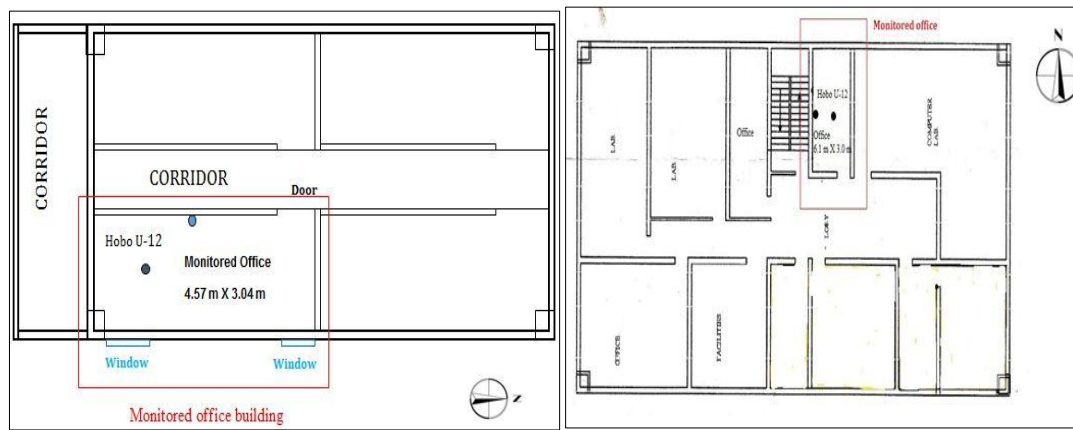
Plan layout of monitored high thermal mass office buildings (a) stone wall construction (b) brick wall construction
